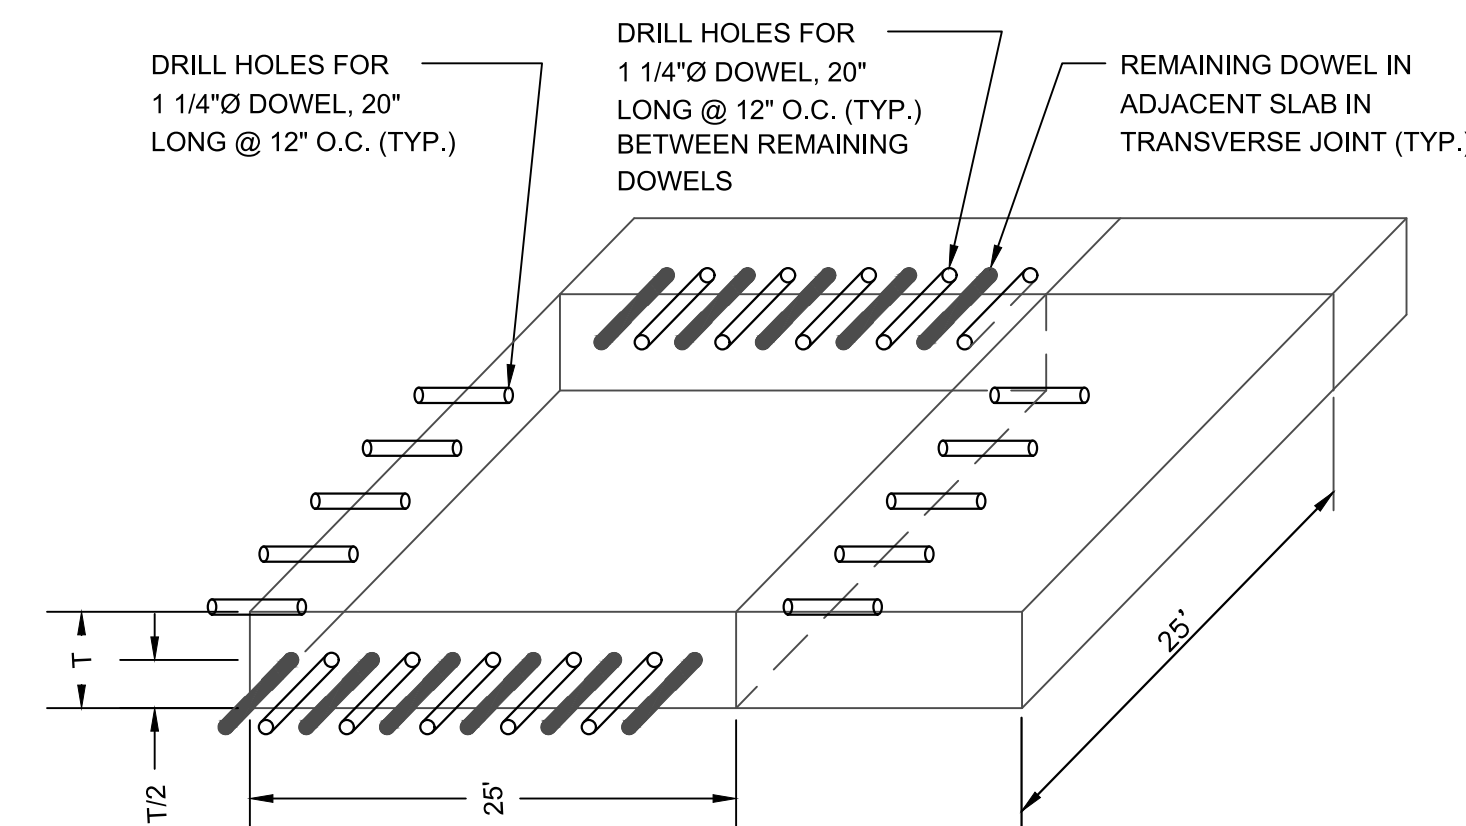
A SAWCUTTING EXISTING FULL SLAB
